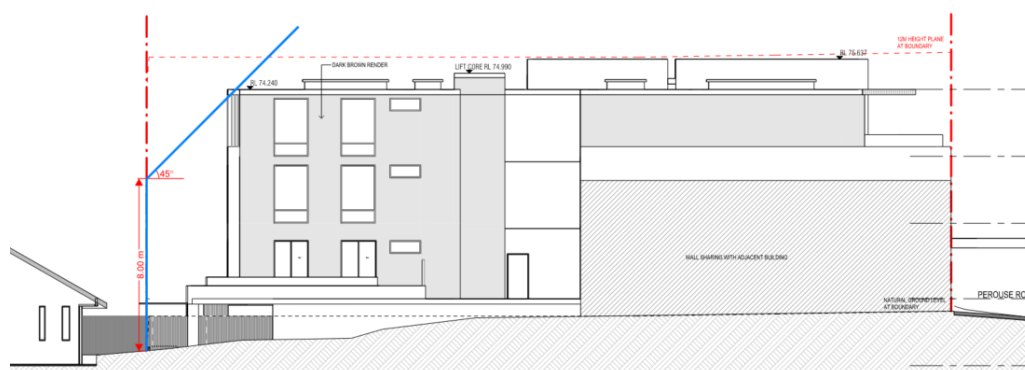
Proposed southern elevation showing the DCP building height plane in blue - 18-20A Perouse Road, Randwick (Source: Curzon & Partners)
